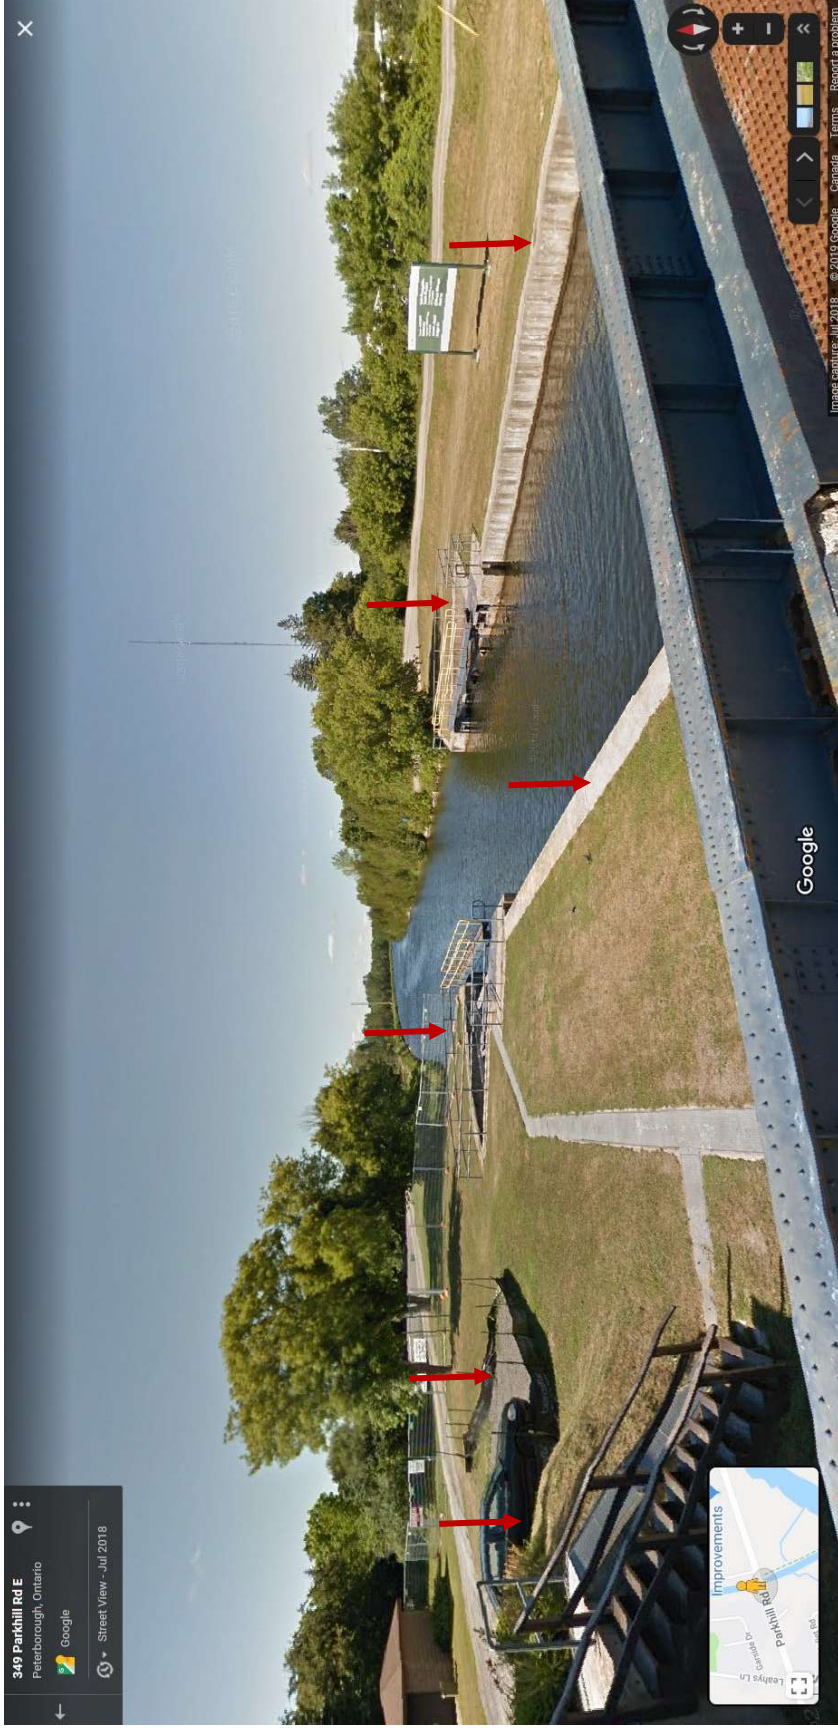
Looking north to Trent-Severn Canal from Warsaw Road Swing Bridge (Google maps, accessed on 25 September 2019). Note the built up area northwest of the swing bridge in the bottom left of the photo, the parking lot north of the Gate house, the canal walls, and the wing shaped gate structure in the canal walls.
